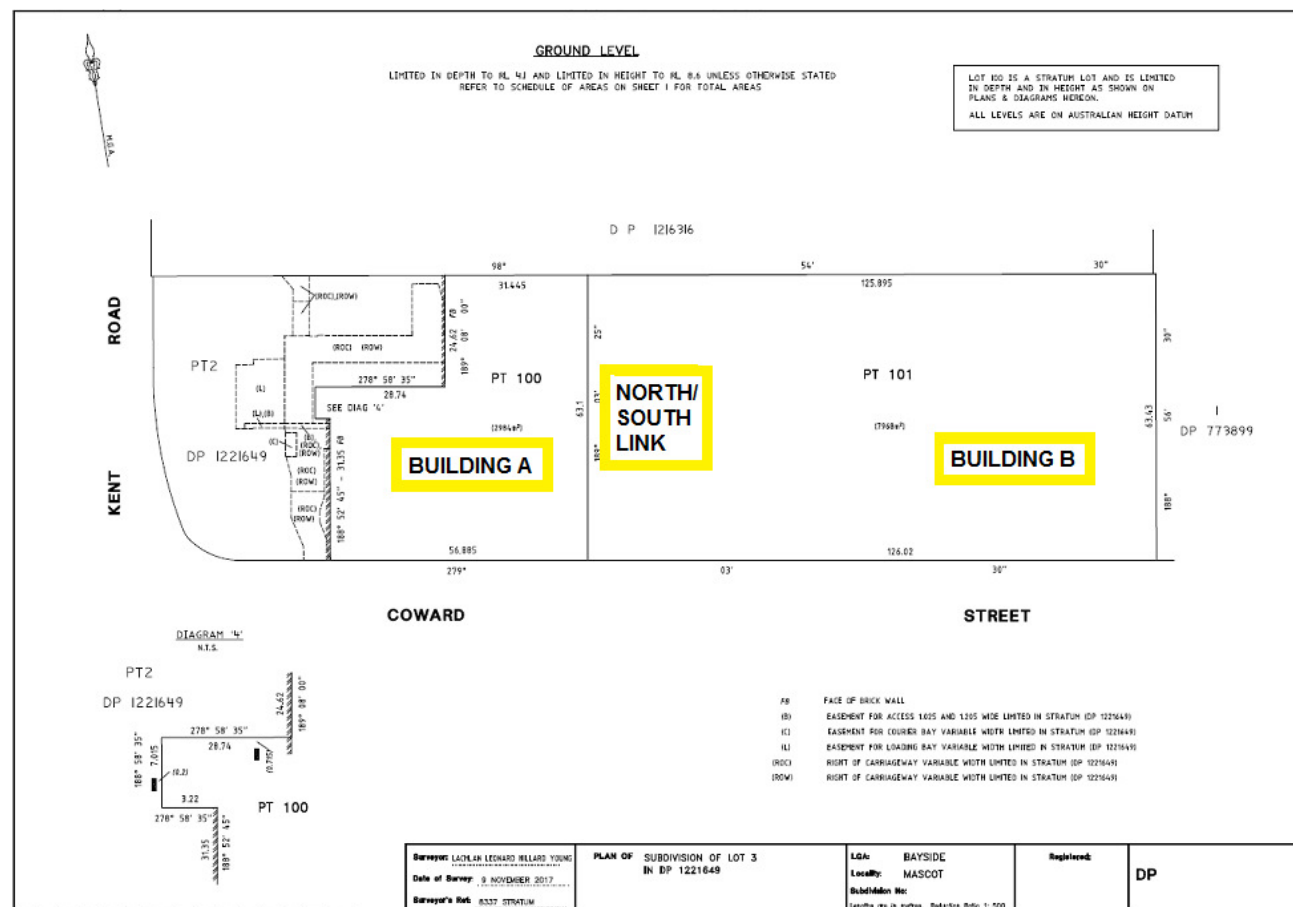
Approved subdivision plan for DA-2017/1220, with mark ups showing Building A and Building B.
